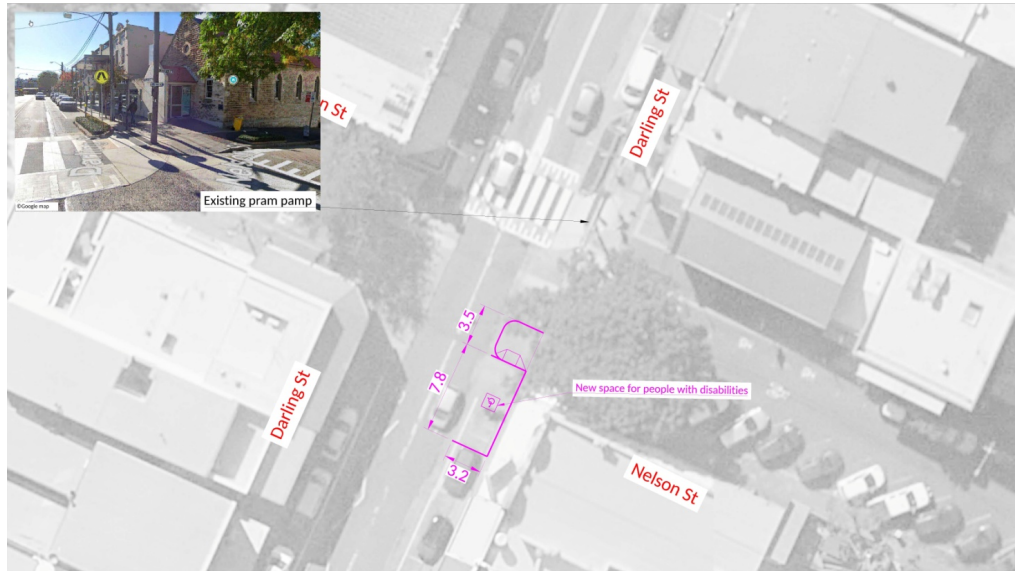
Proposed Persons with Disability parking space on Darling Street near Nelson Street.
